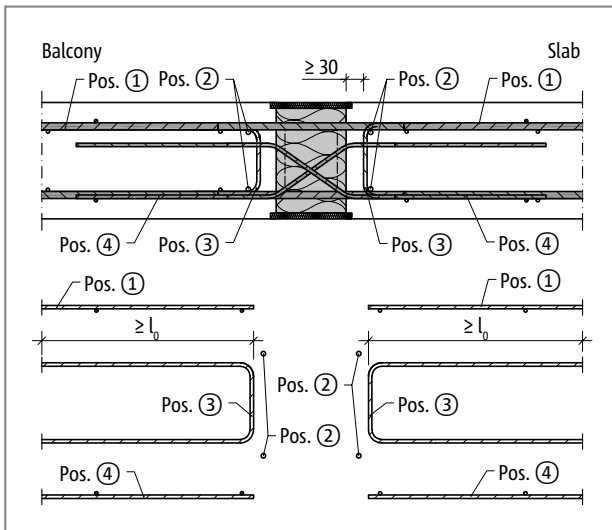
Schöck Isokorb® XT type D: On-site reinforcement
